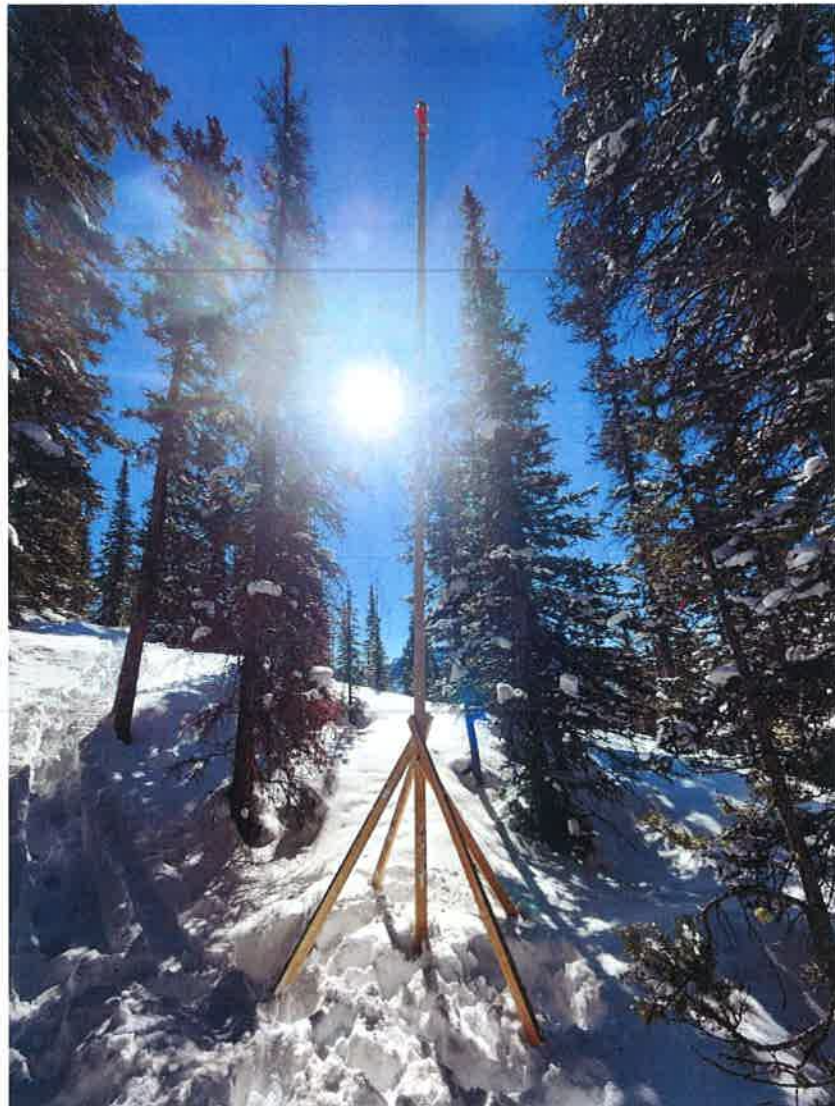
The location of the proposed building location, marked with the 30' story pole.
